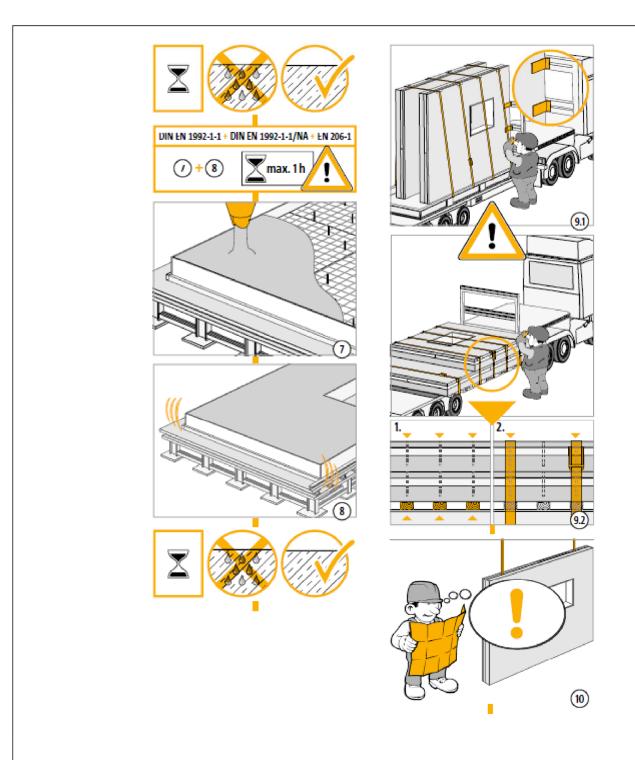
Installation instruction - Schöck Isolink® for sandwich wall – page 2
